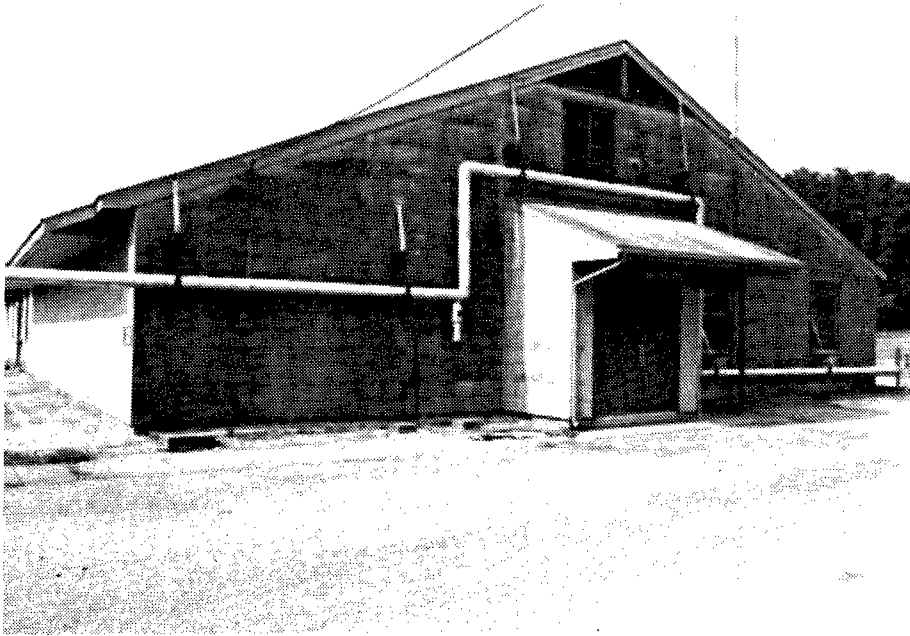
Building 12: General Instruction Building presently used for instruction and training.
